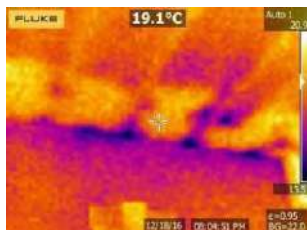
shows a garage conversion interior - the top of the wall (where the eaves are) is markedly colder, and there's patchy insulation in the ceiling.
